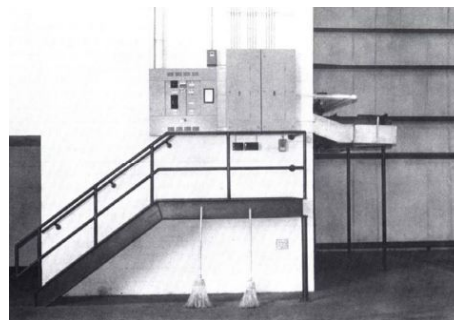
Elevating the electrical utilities is an example of wet proofing (source: FEMA, 2007)
